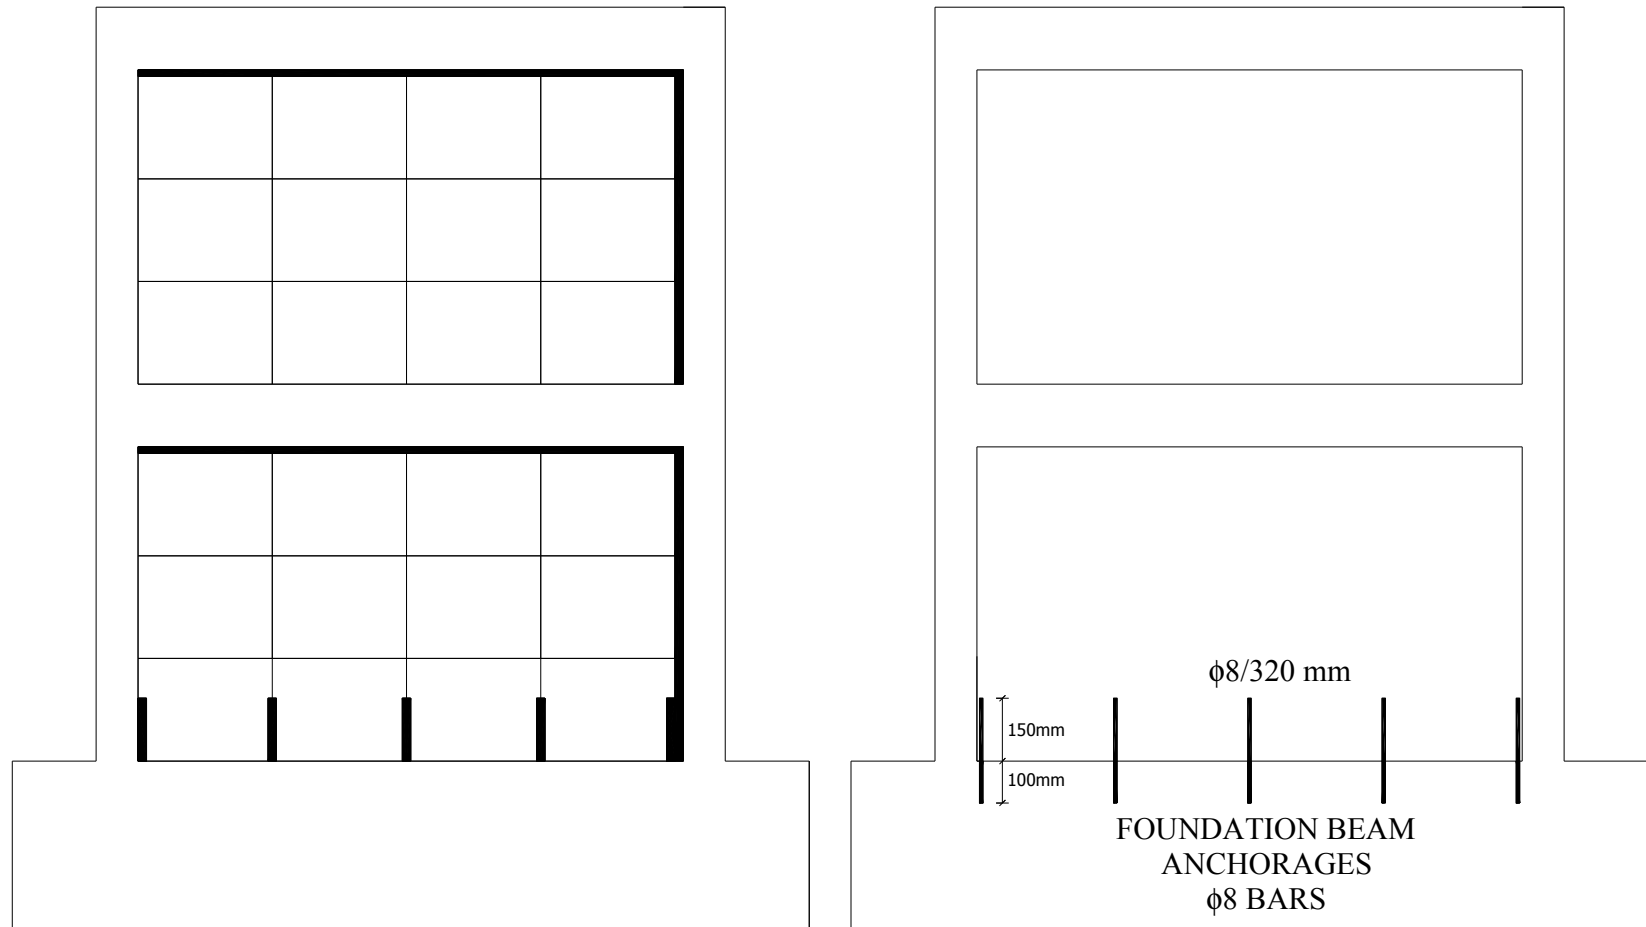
Panel arrangement and configuration of the dowels for Specimens CIC1 and LIC1
